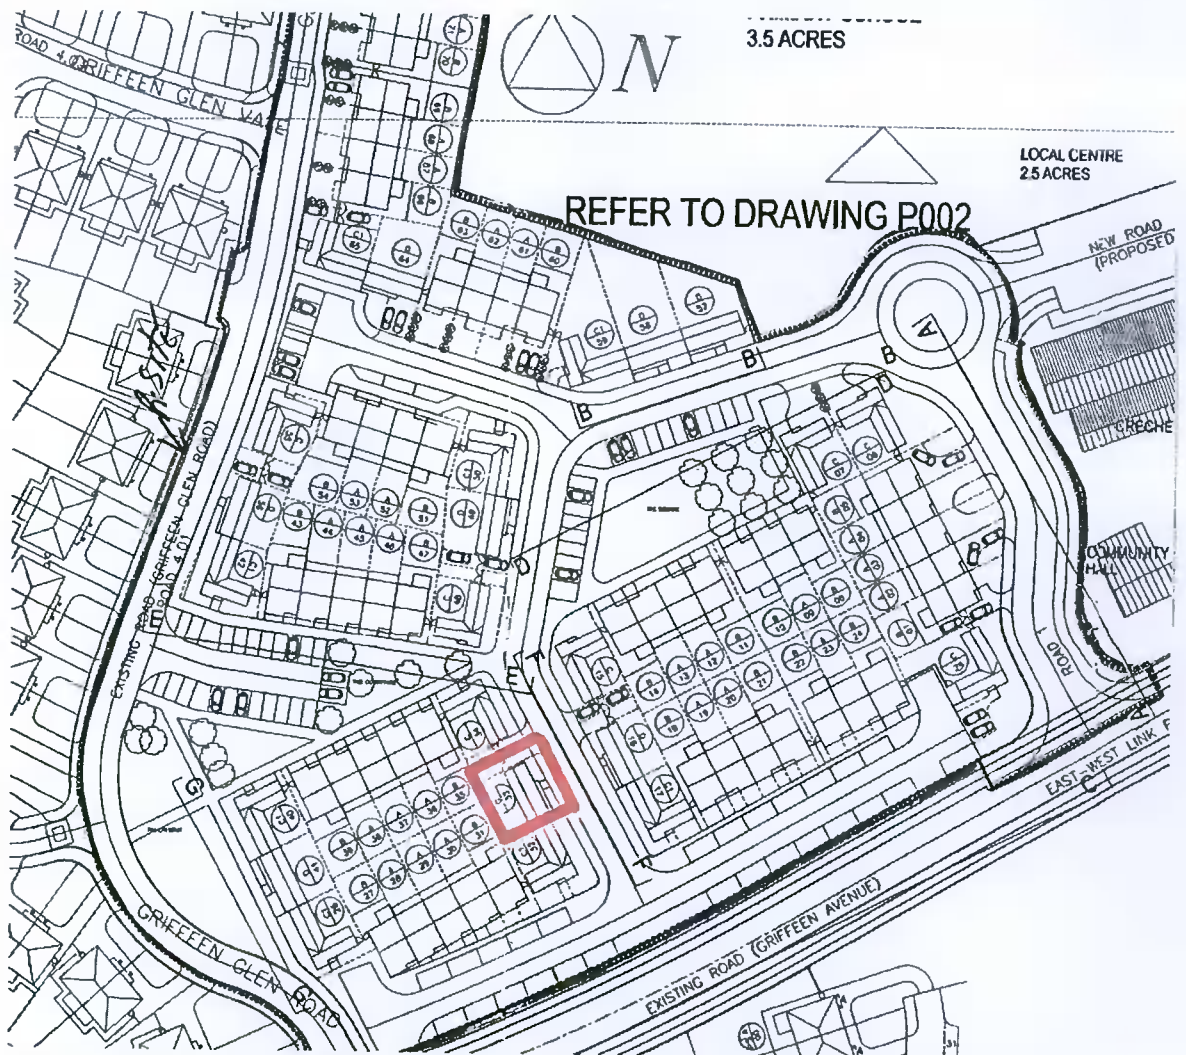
Original site layout for surrounding residential estate (subject site outlined in red).
